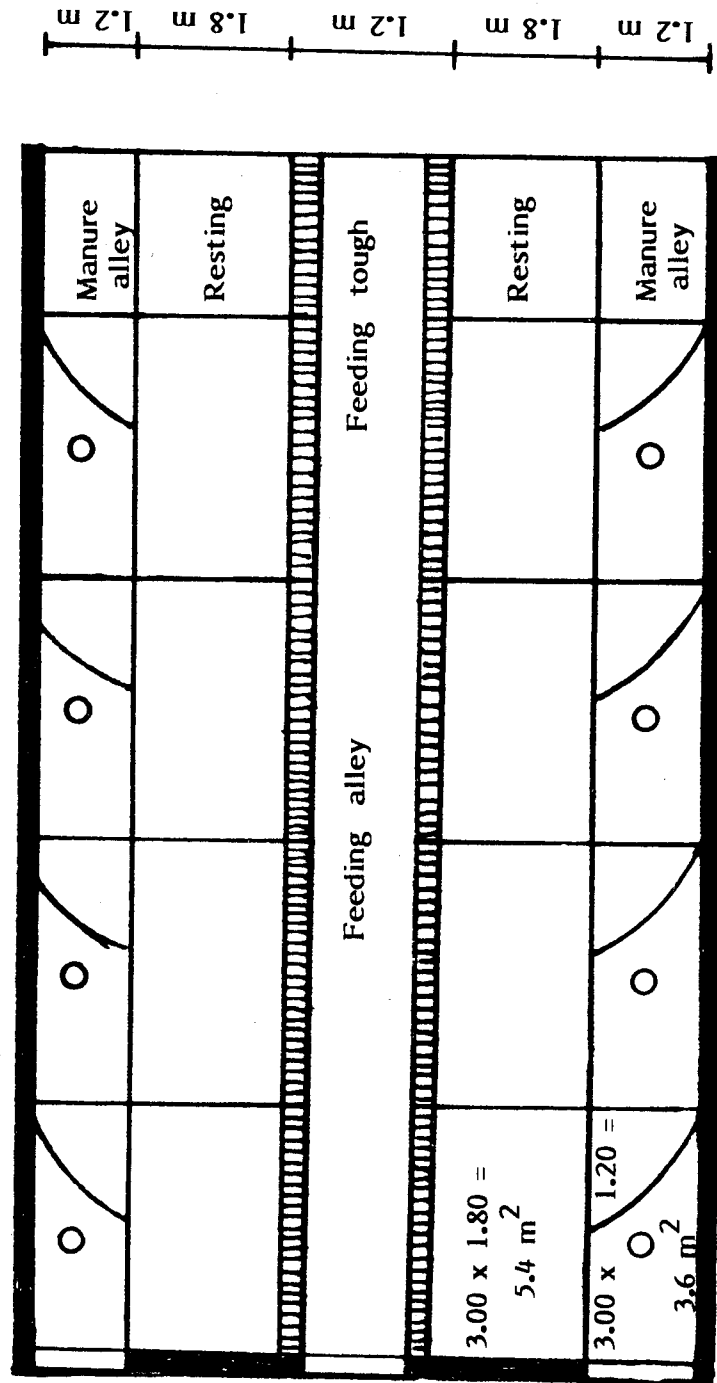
Housing Plan for Growing/Finishing Pigs.
